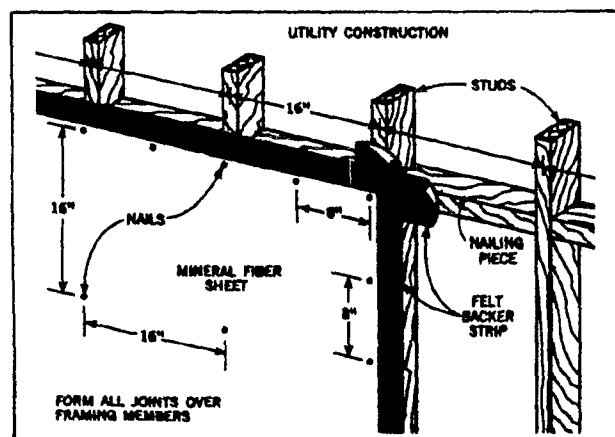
DIRECTLY TO STUDS - Use 1/4 in. Mineral Fiber Flat Sheets with maximum stud spacing of 16 in. on center; use 3/8 in. sheets for studs 24 in. on center. Use a No. 30 Asphalt Saturated Felt underlayment on all except utility construction.
